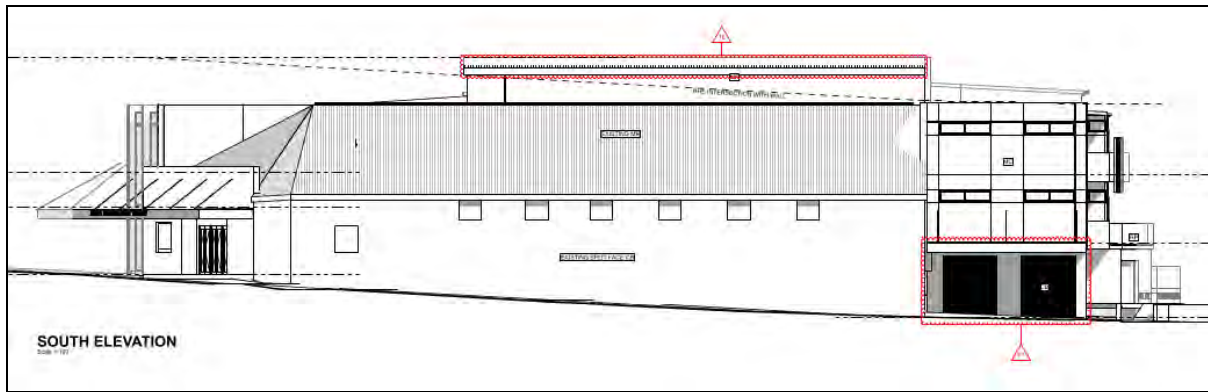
Southern Elevation of the proposed development (Part 3) (additional height Cinema 2 roof edged in red)
